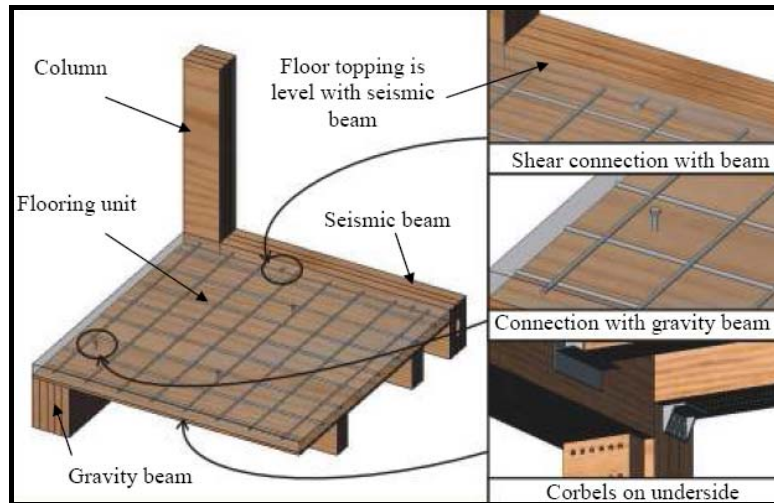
Typical Timber-Concrete Composite Slab Connection (Smith, 2008b)
